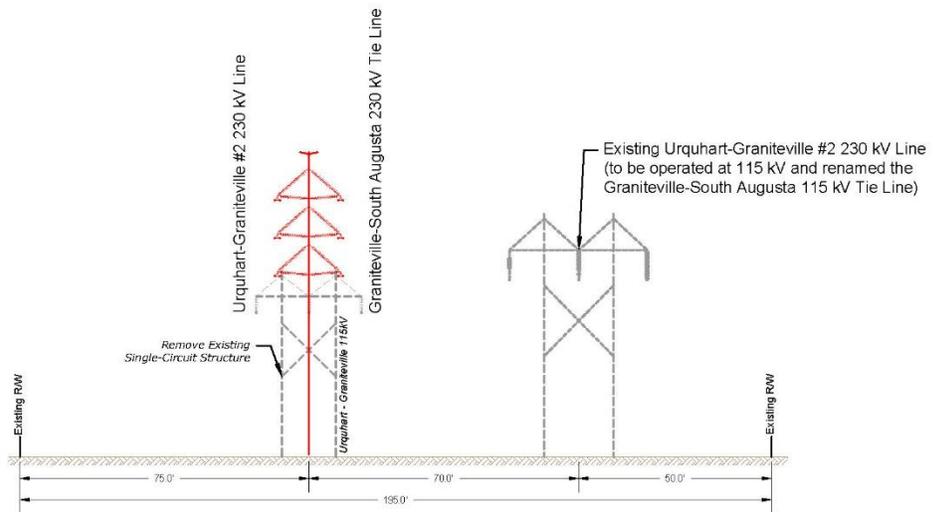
Existing Structure No. 330 to Howlandville Road
